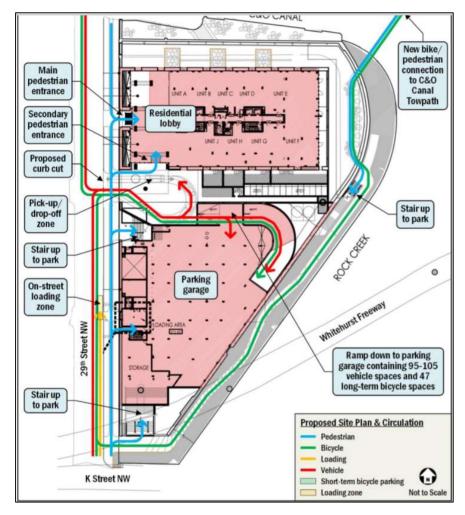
Site Plan and Circulation (Source: Gorove/Slade 3/15/2021, Transportation Statement, Figure 4)
